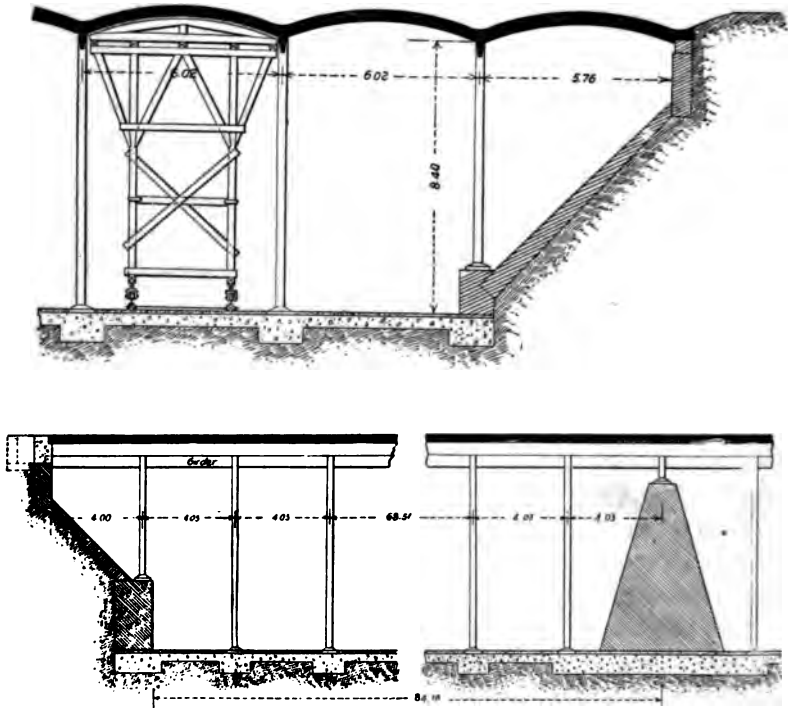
Plan and Sections of Reservoir at Madrid, Spain.
